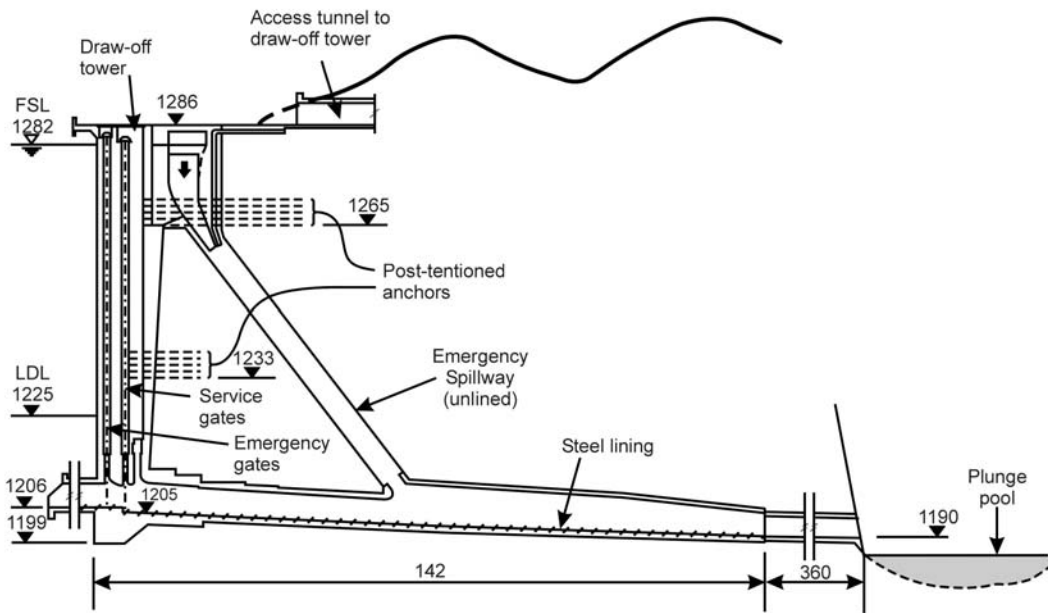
Combined Intake of Bottom Outlet and Spillway of Papan Dam
